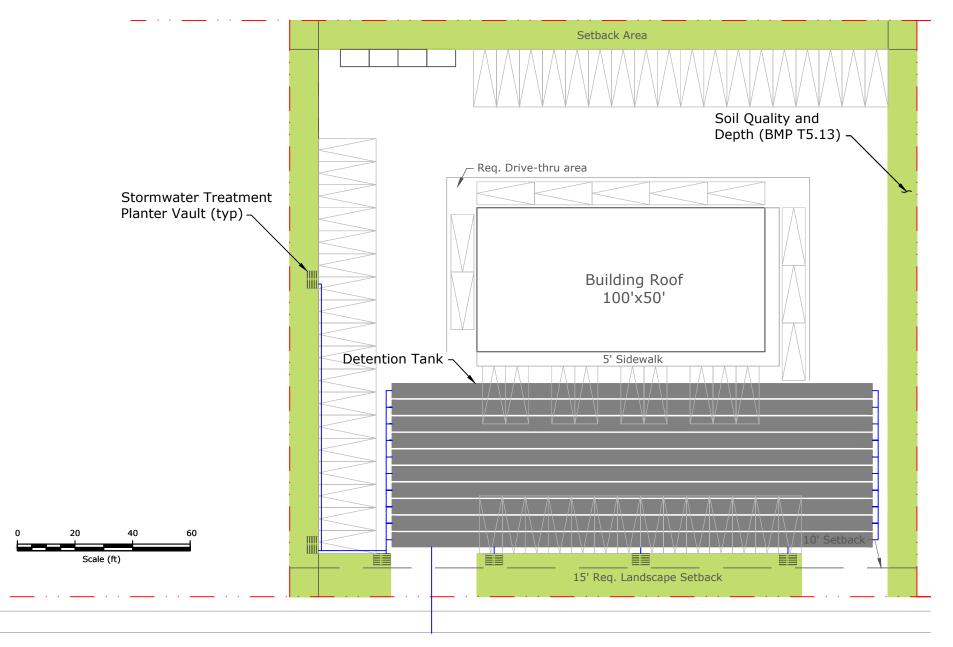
Scenario 8. Permanent Stormwater Site Plan – Small Commercial Development, 2005 Requirements, Till Soils
